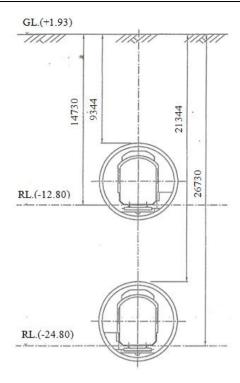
A typical cross-section of the Metro No. 1 at the Opera House (URMB 2010)
